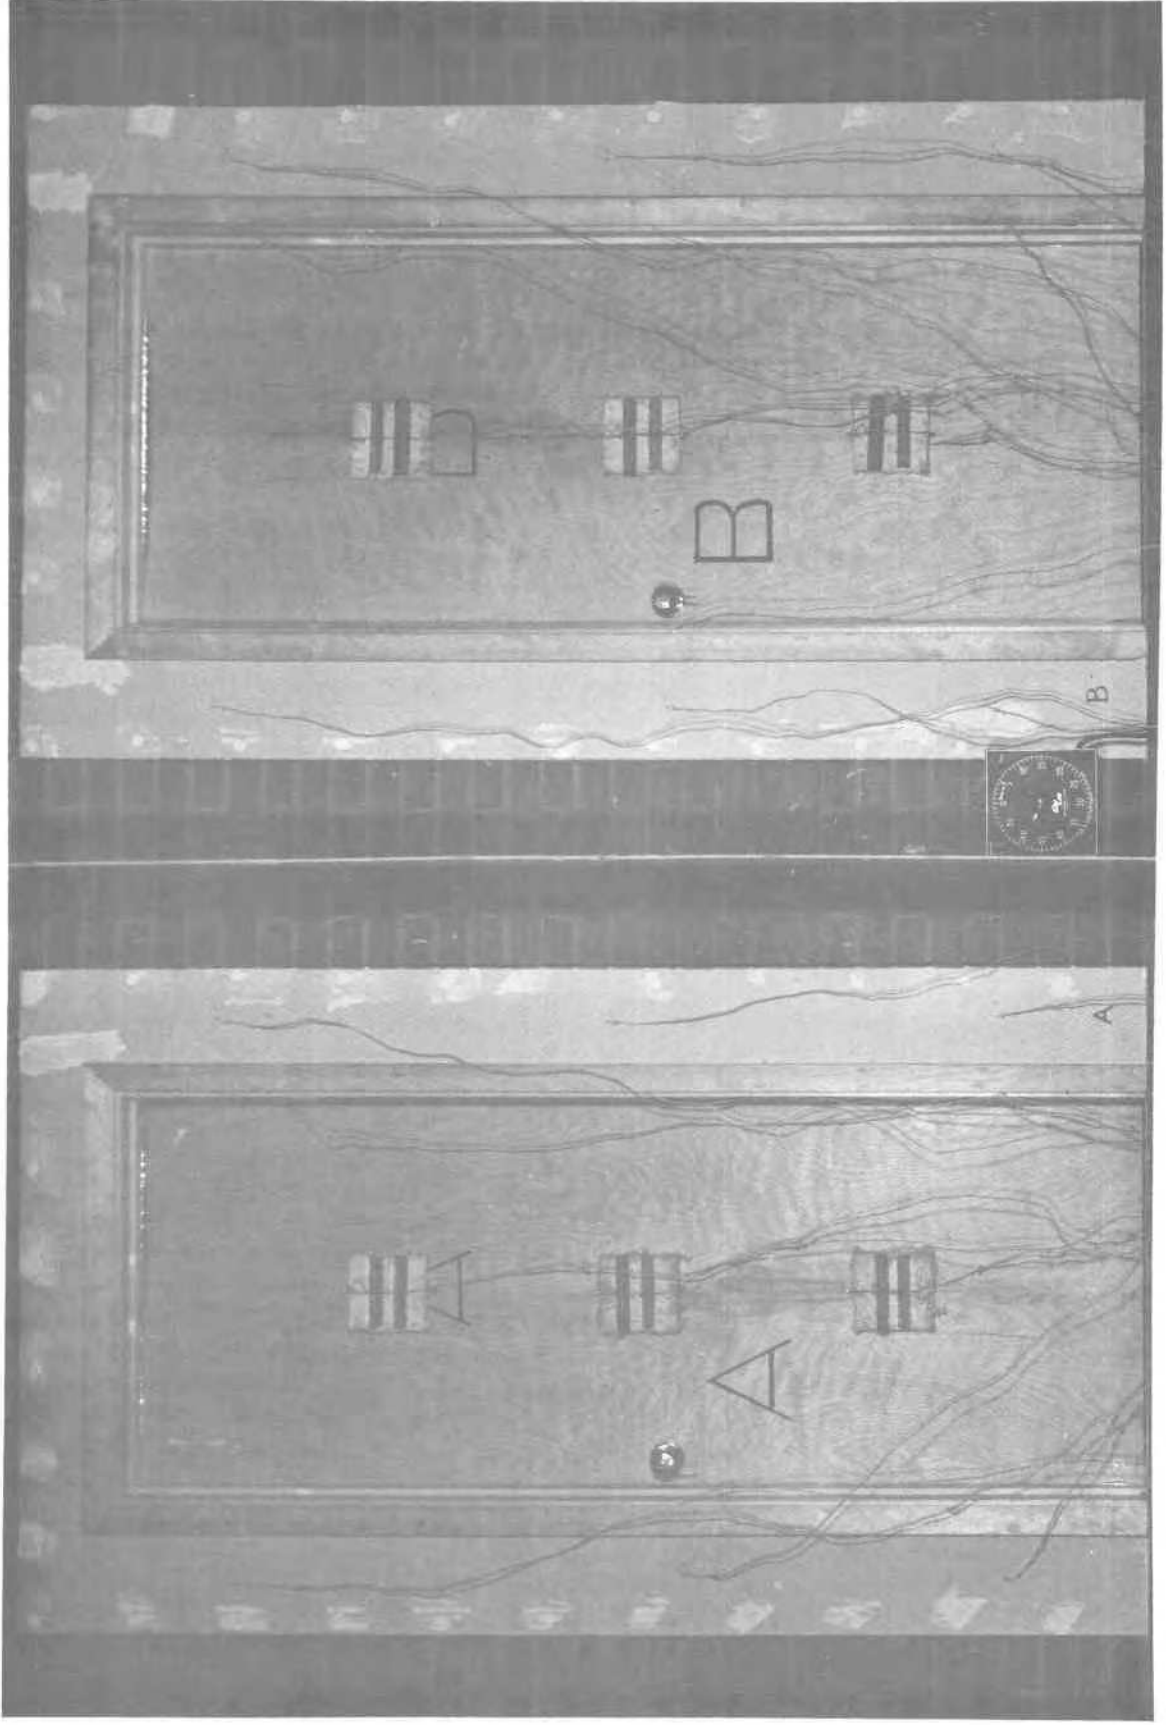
Door Test No. 1. Unexposed face at 10 min.
